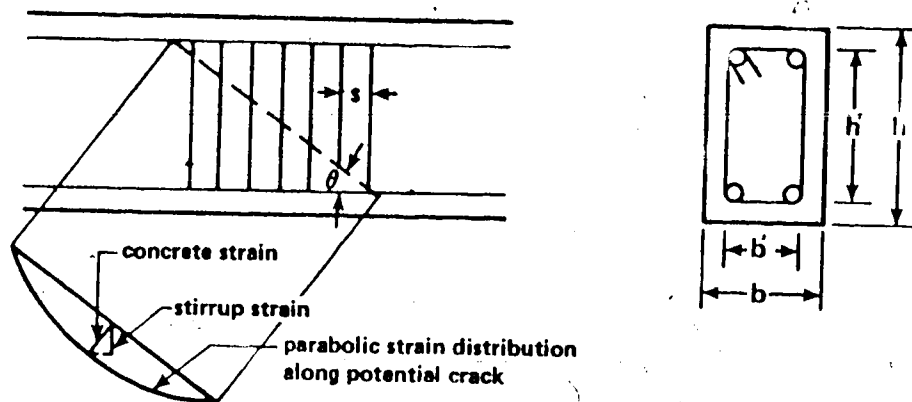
CRACKING STRENGTH — CONTRIBUTION OF STIRRUPS
